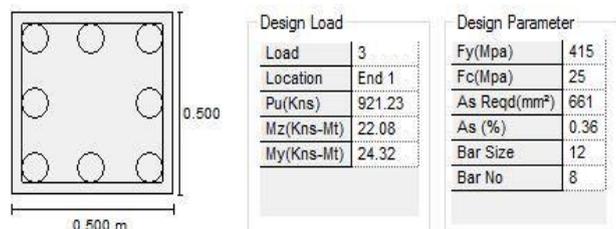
; Reinforcement details of column No.14 in STAAD Pro. Using design code IS- 456:2000
